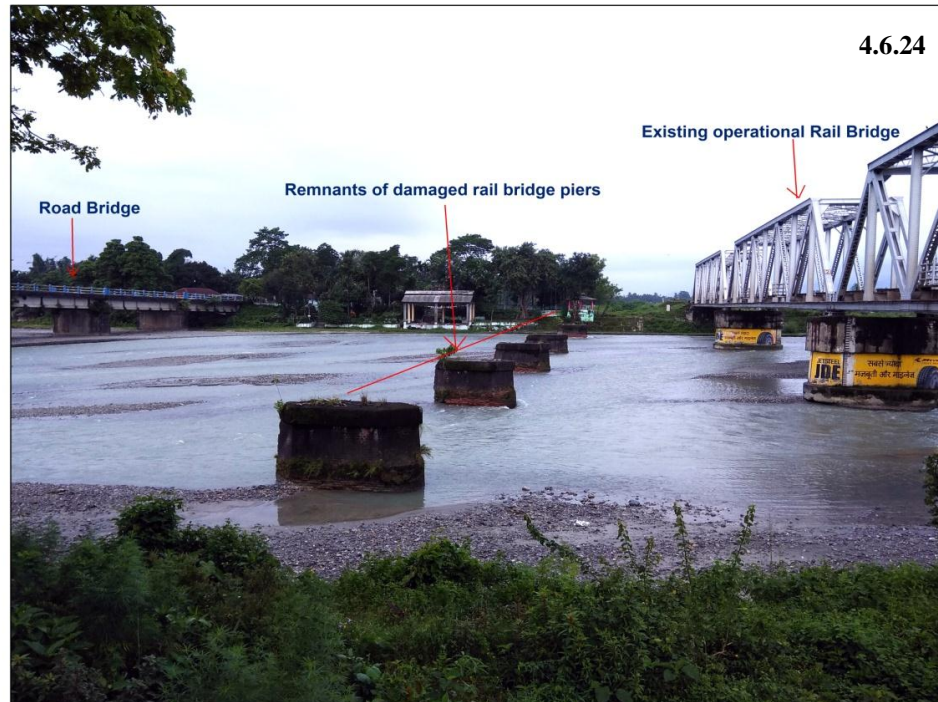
Remnants of old damaged railway piers in between functional Rail and Road Bridge at Odlabari. The number of piers in the new railway bridge has been reduced to only two instead of five in the older one.
